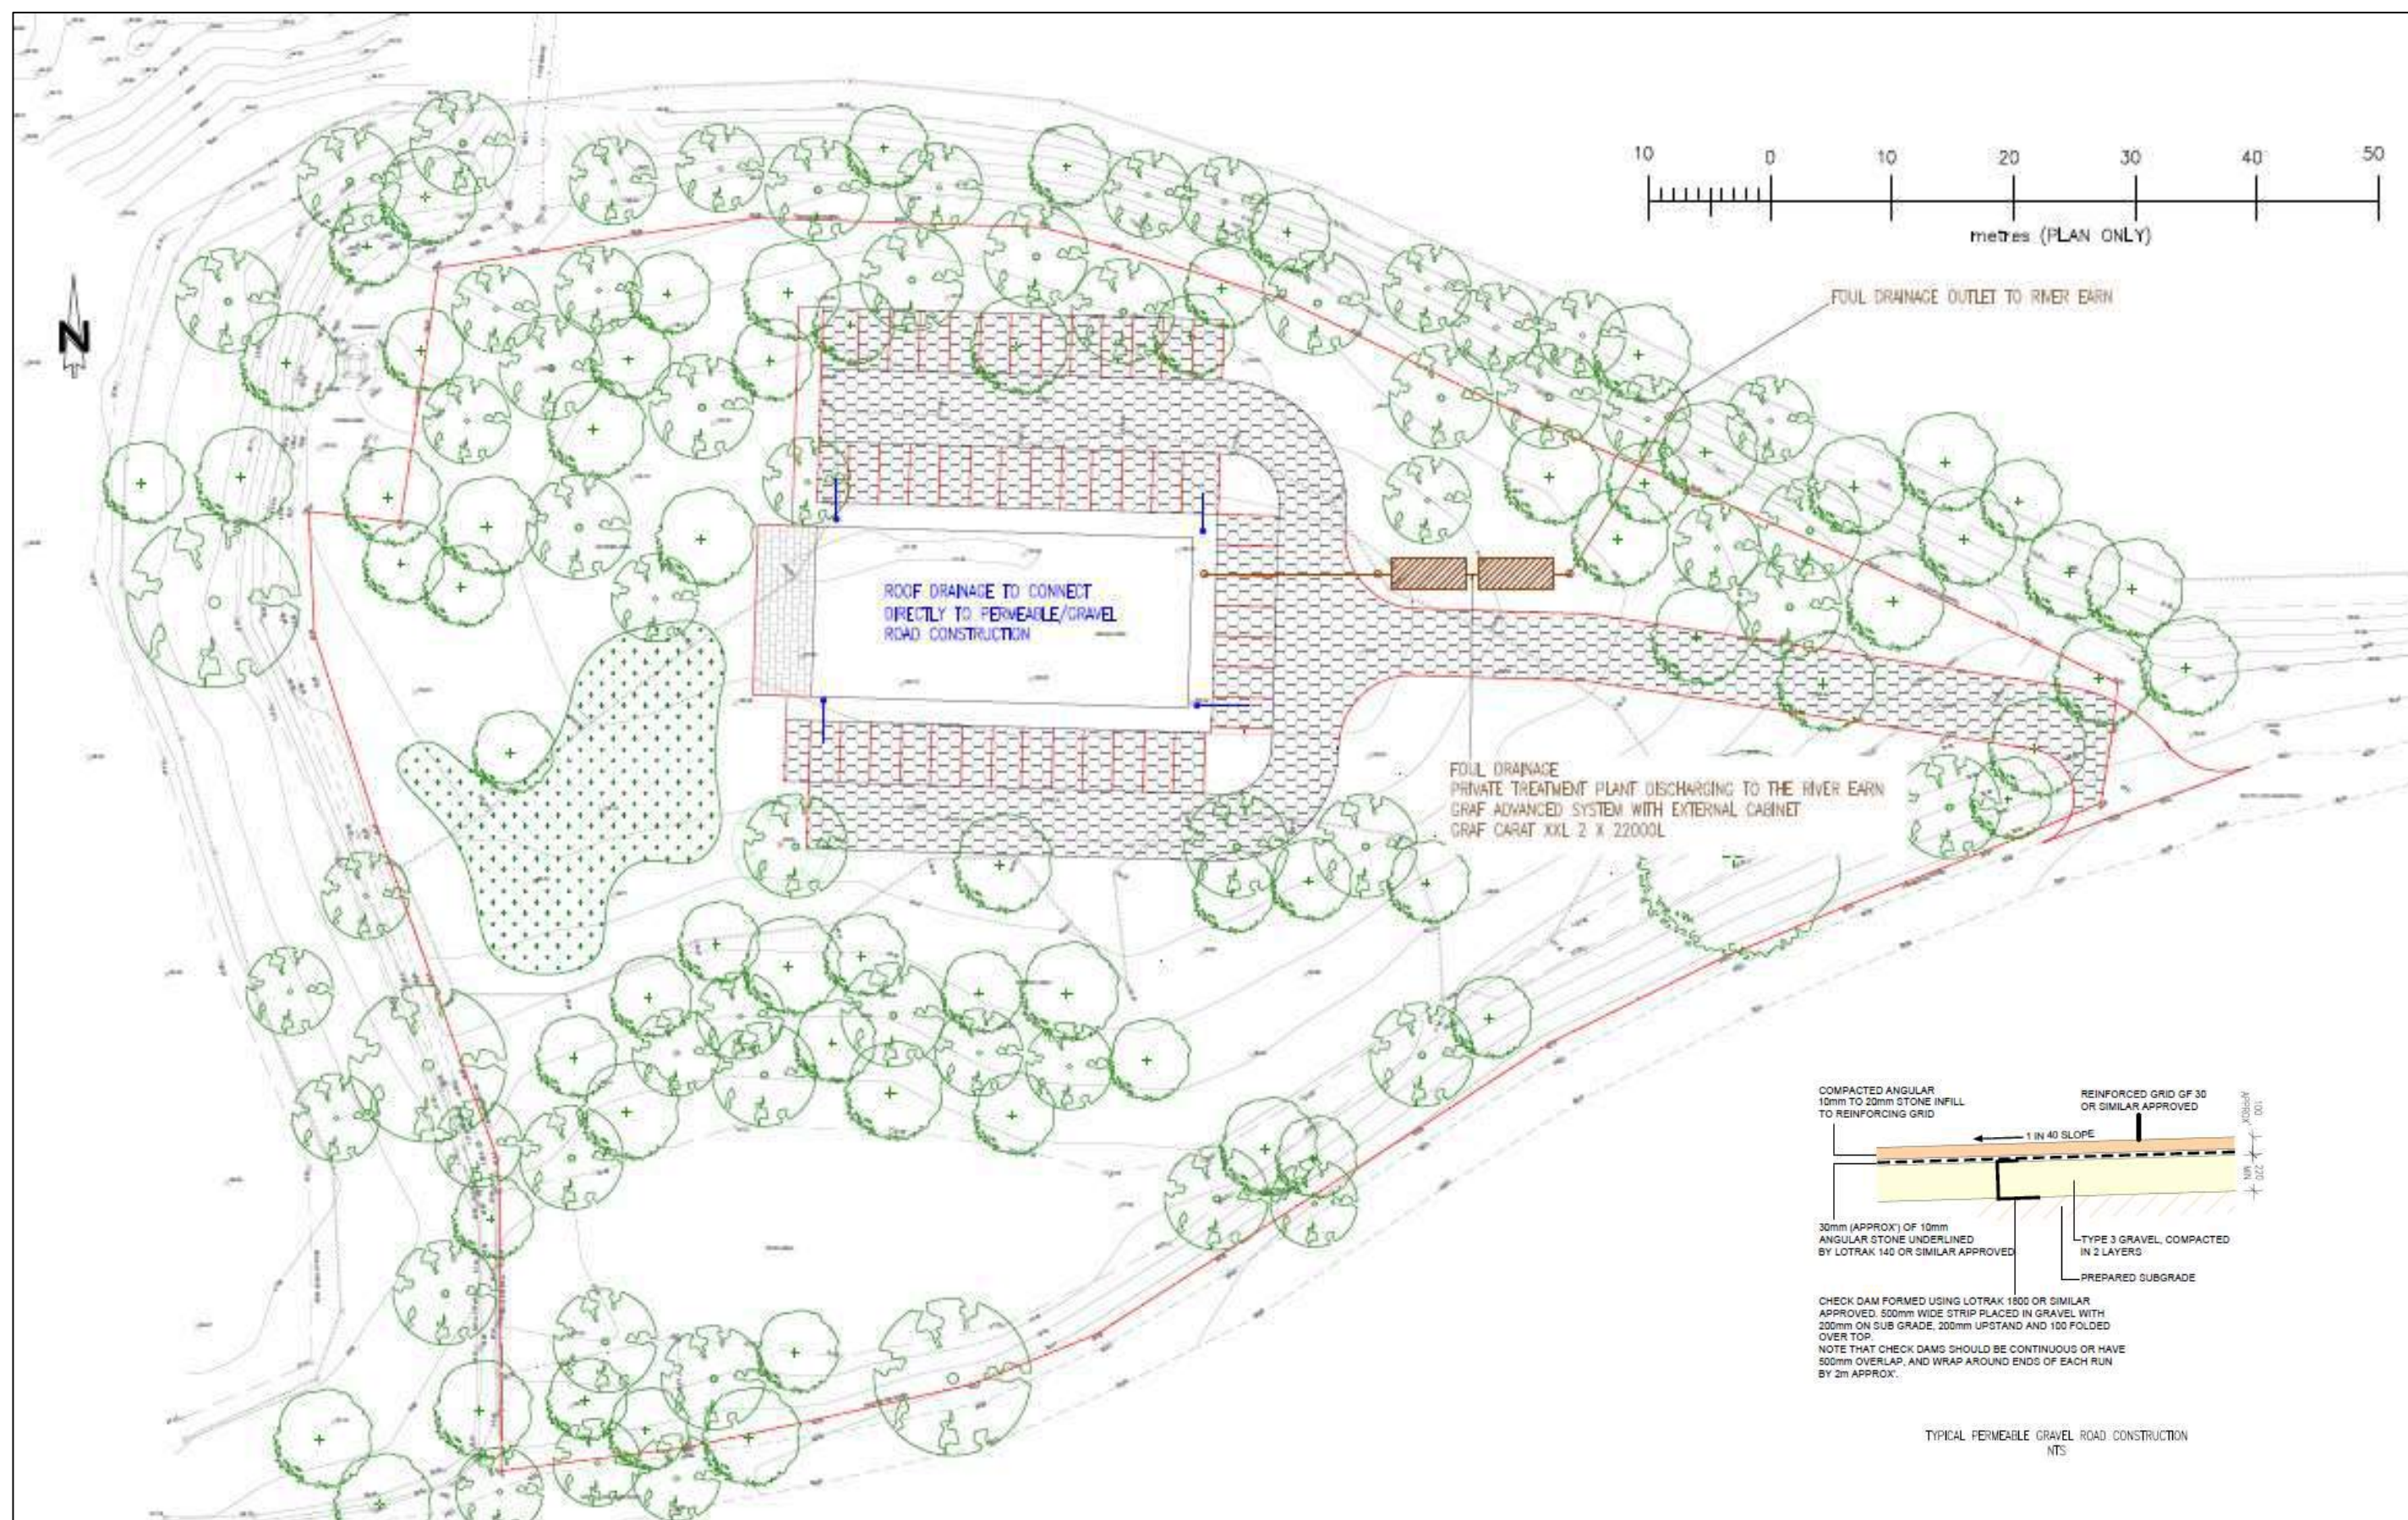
Surface water drainage system, proposed permeable gravel surfacing with connected roof drainage, and showing foul drainage network and treatment plant location (excerpt from AA-DD-196b-002 Drainage Strategy Plan).
